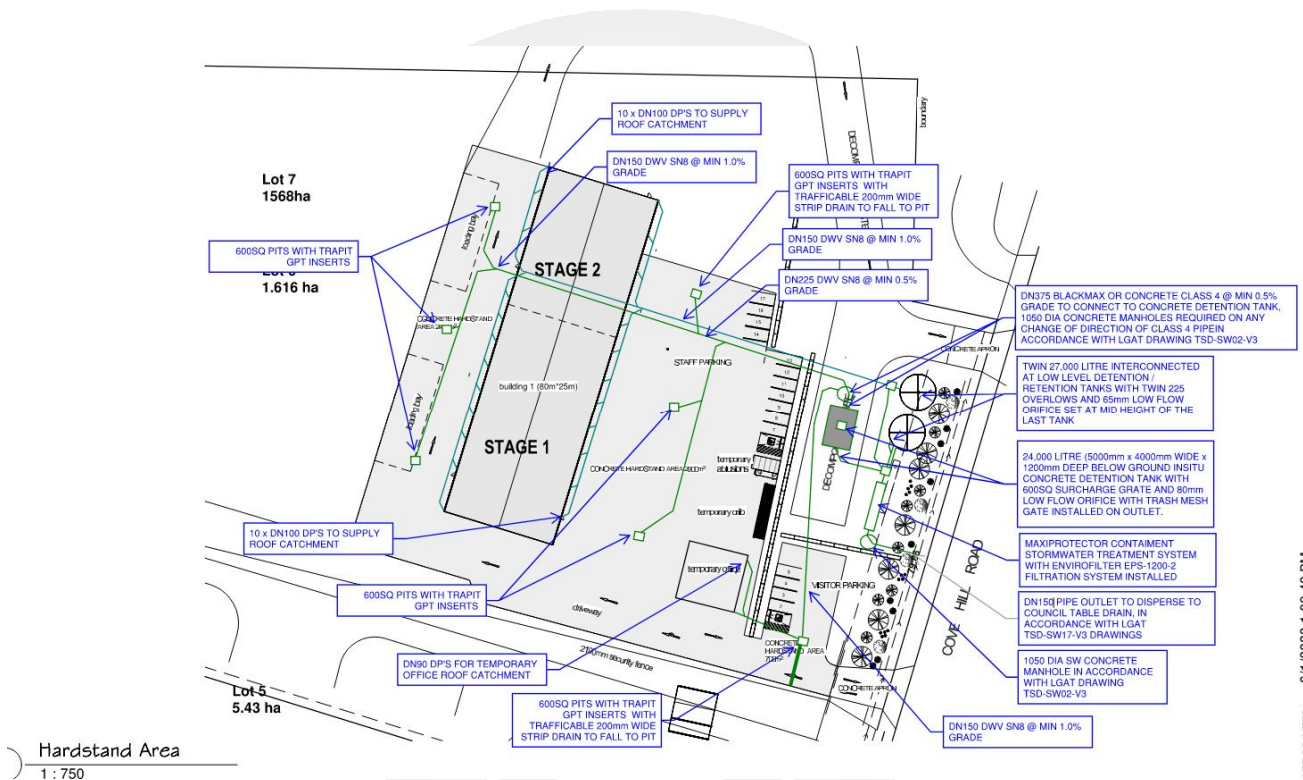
PROPOSED STORMWATER SITE LAYOUT
